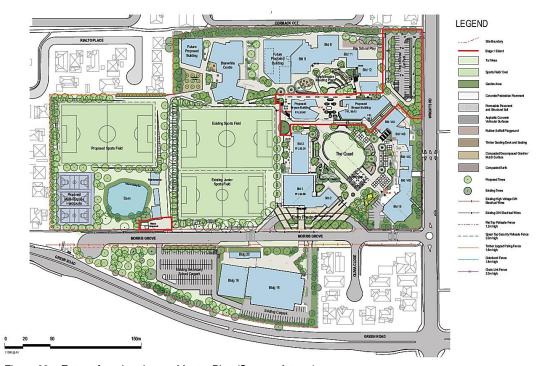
Extract from Landscape Master Plan (Source: Arterra)
